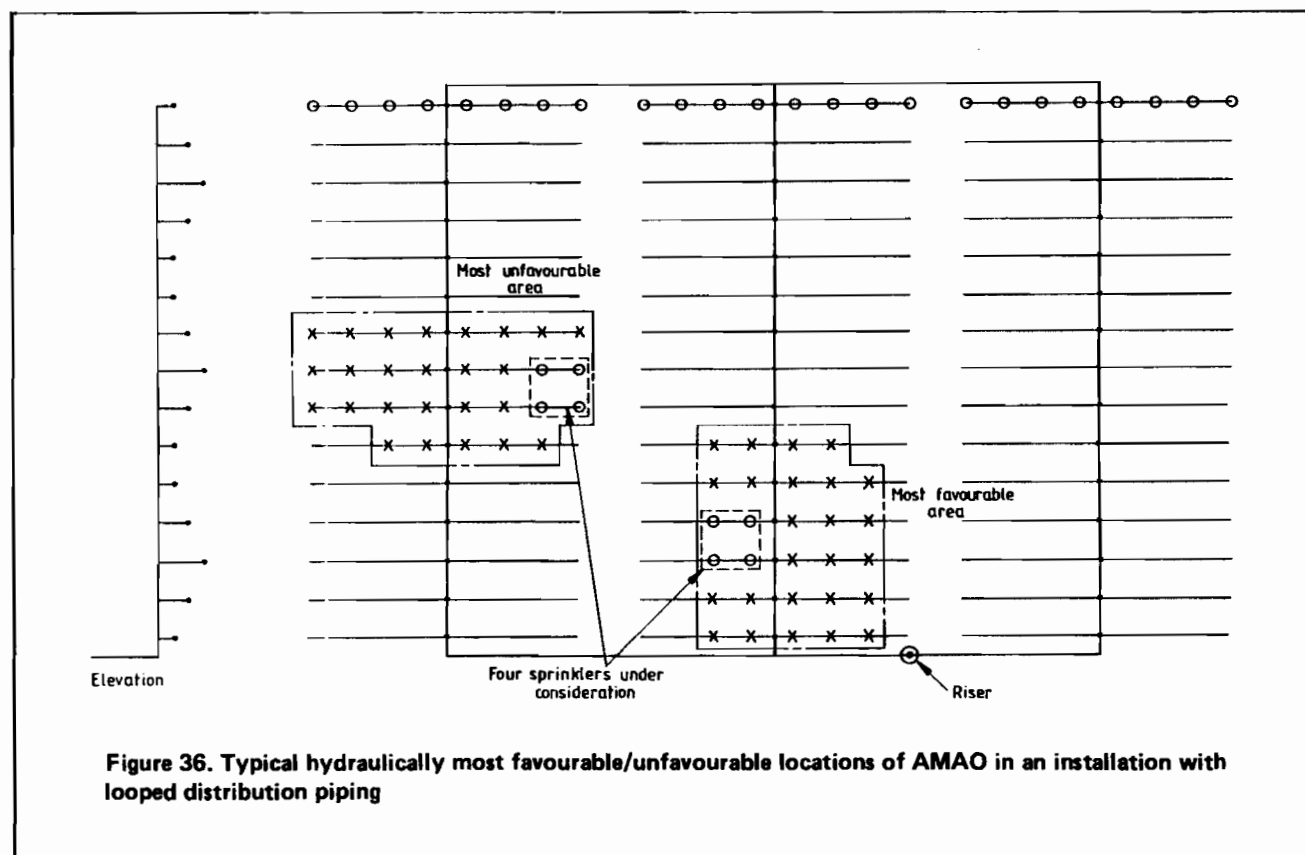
Typical hydraulically most favourable/unfavourable locations of AMAO in an installation with looped distribution piping
